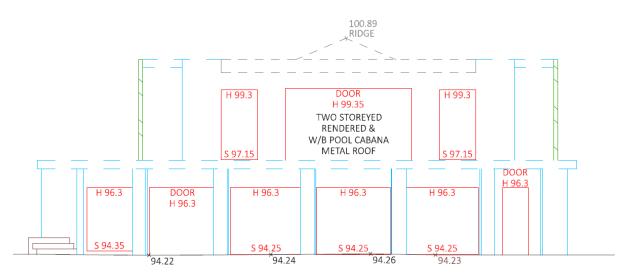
Site survey plan of the pool house (Source: ESA Surveys)
